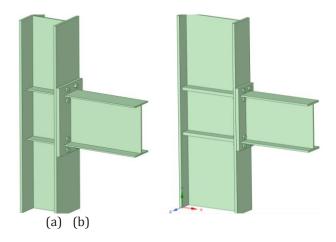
(a) American section 4-Bolt Extended Unstiffened End Plate Connection (b) Indian section 4-Bolt Extended Unstiffened End Plate Connection
